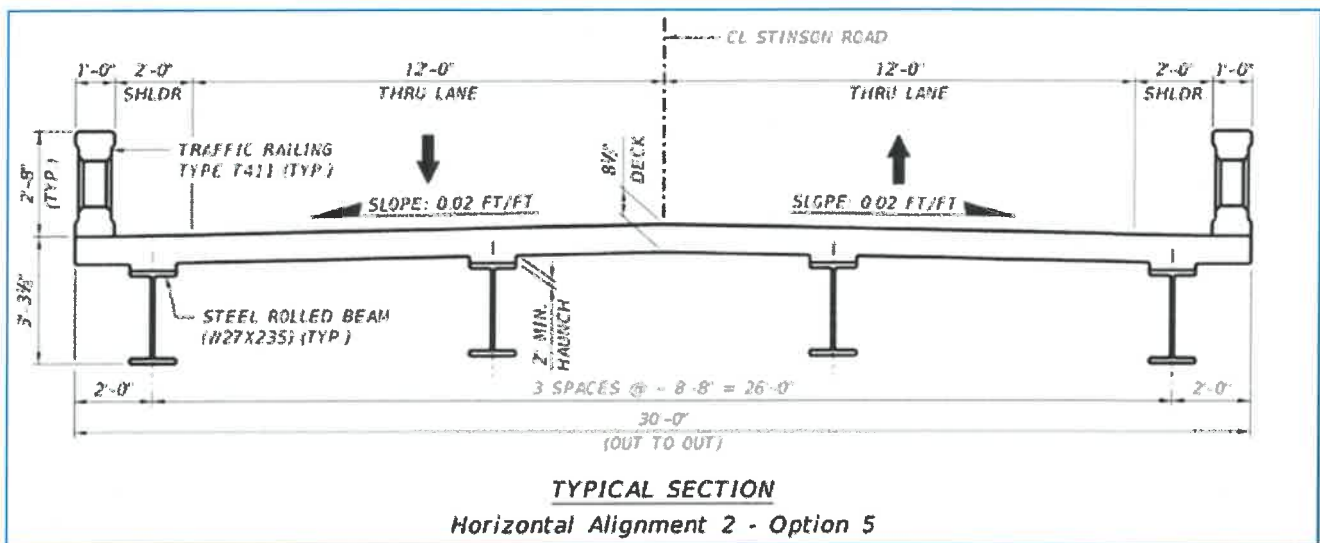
Steel Rolled Beams (W27X235) Typical Section
